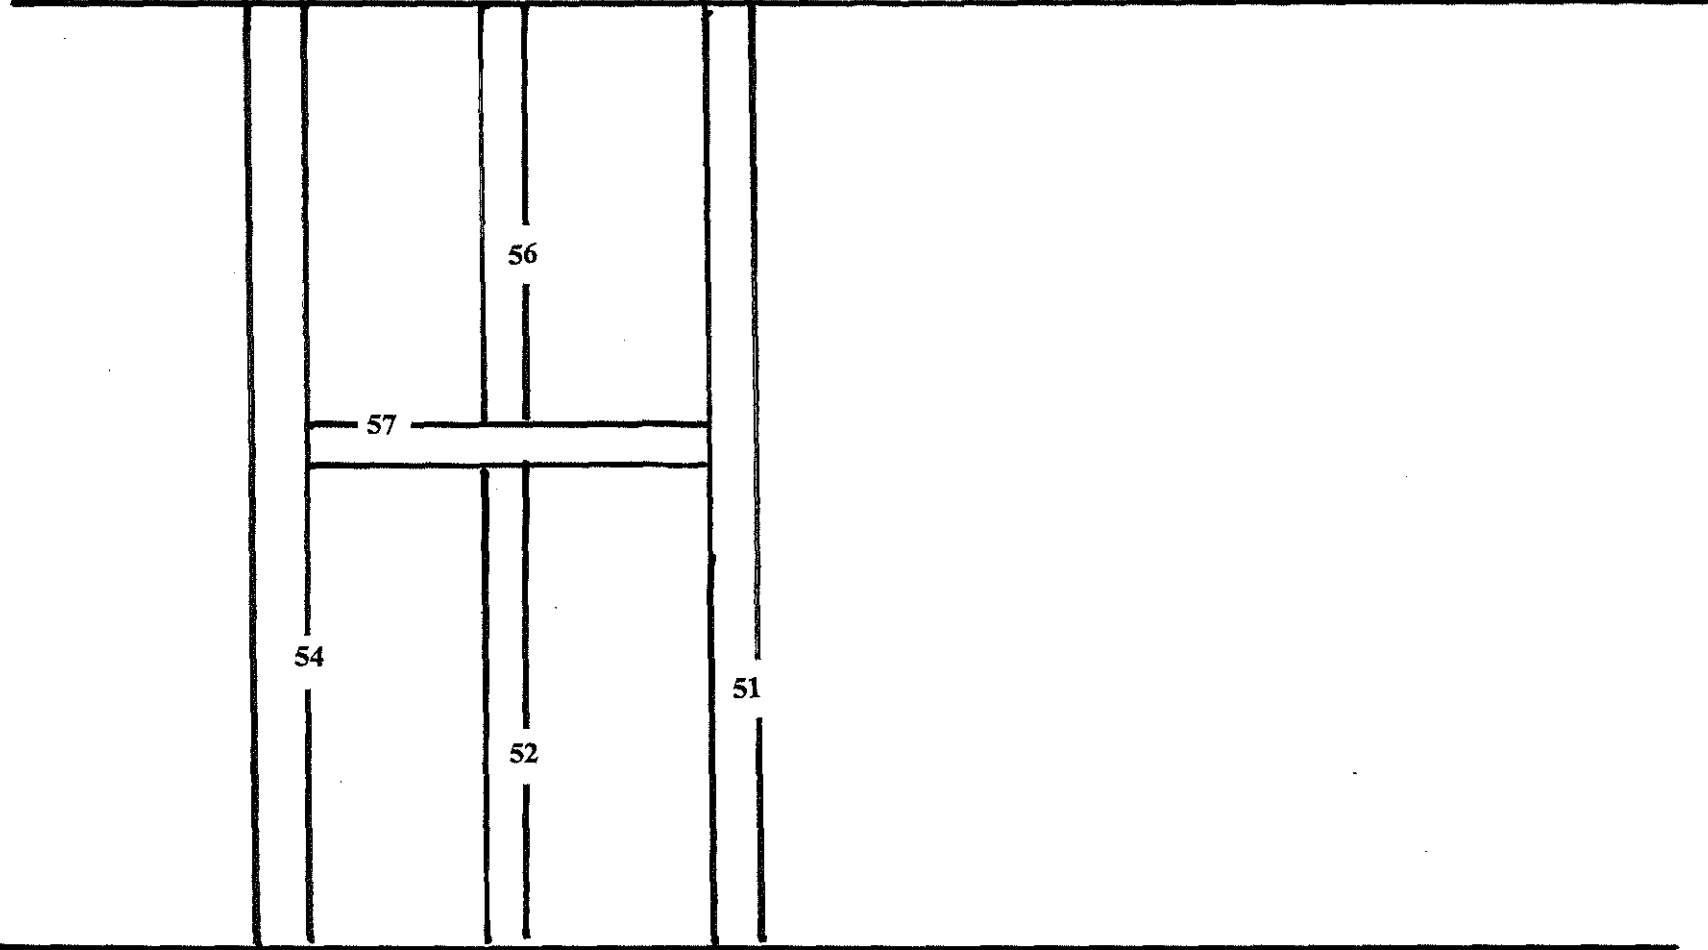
Sketch drawing of the infill panel of the west wall of the Orange room to show position of timbers sampled (viewed from the east looking west)
